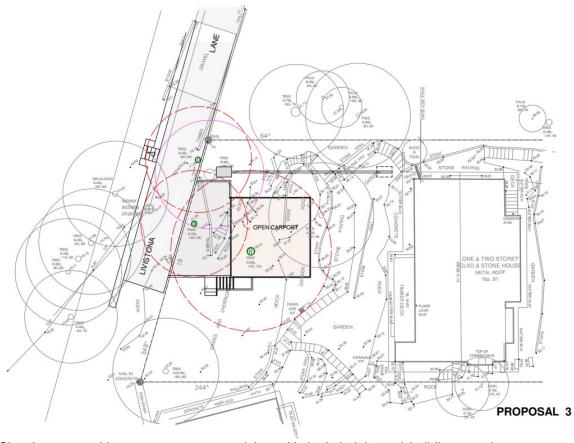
Showing car parking arrangement complying with both height and building envelop requirements however will impact additional tree removal
